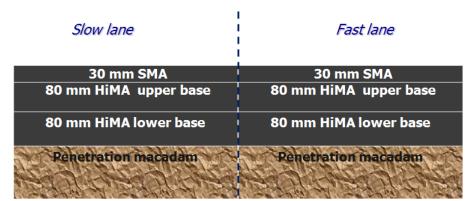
Diagram showing the proposed HiMA pavement for the trial section
